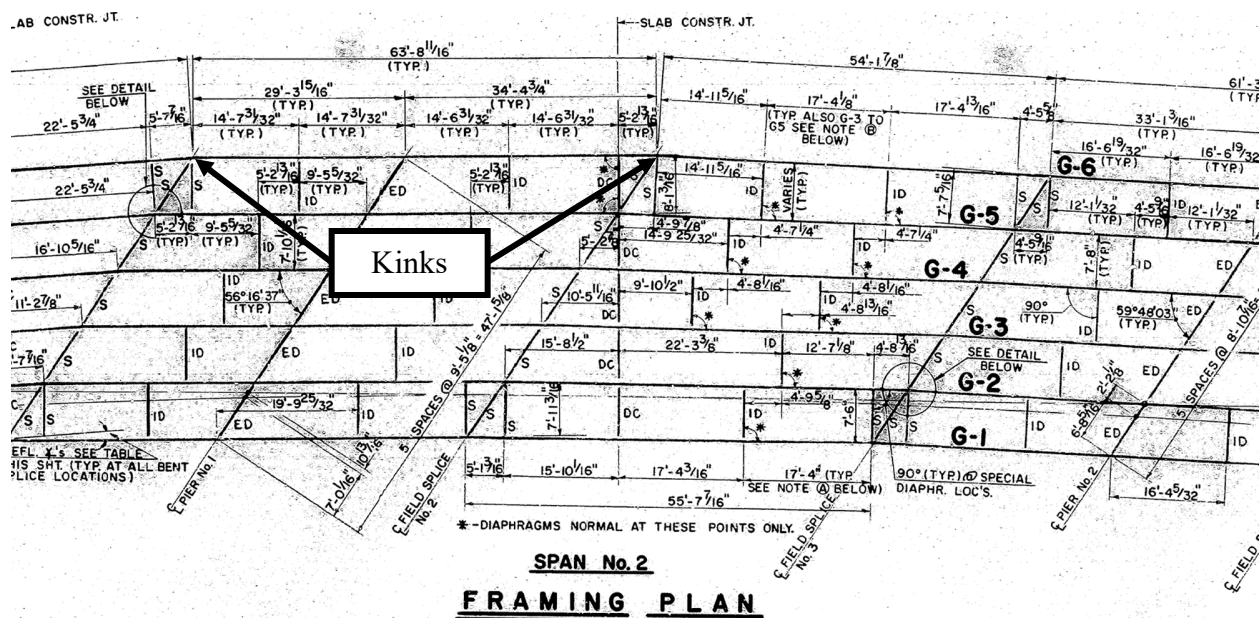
Example of a Kinked Girder Bridge (Partial-Framing Plan Shown)
